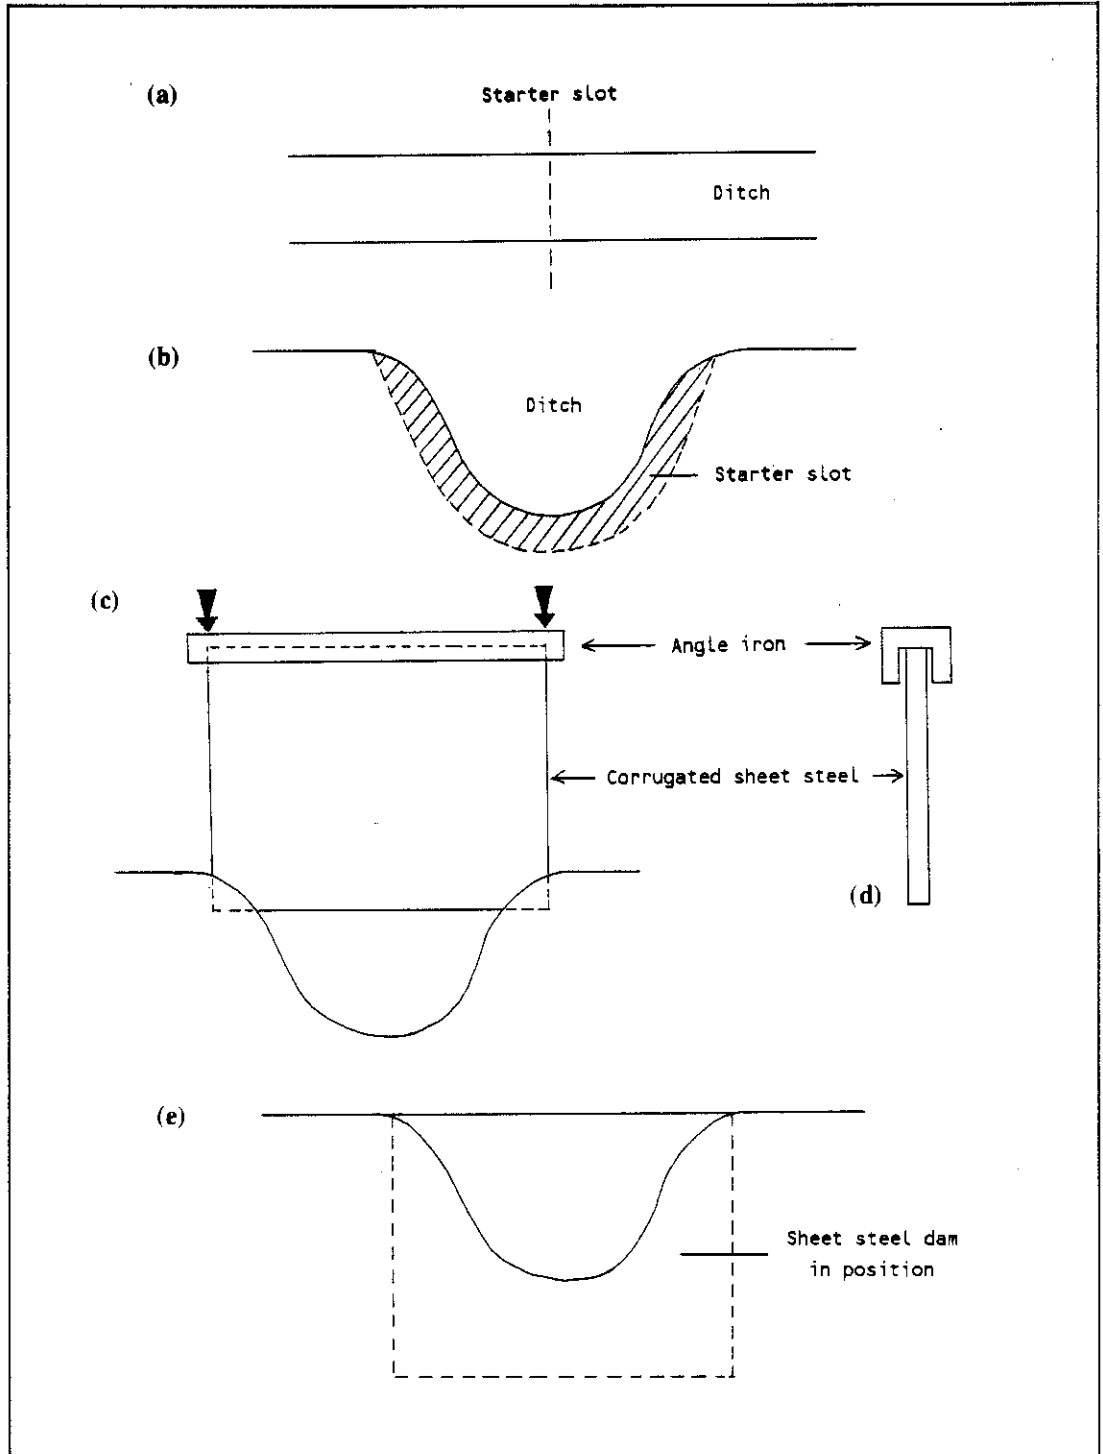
The procedure for inserting a sheet steel dam. A starter slot is cut across a ditch penetrating any tussocks or tough roots; (a) plan view; (b) cross-section. A sheet of corrugated steel is inserted into the slot and topped with a length of angle iron; (c) front view, (d) side view. When the top of the sheet is flush with the ground the angle iron is removed (e).
